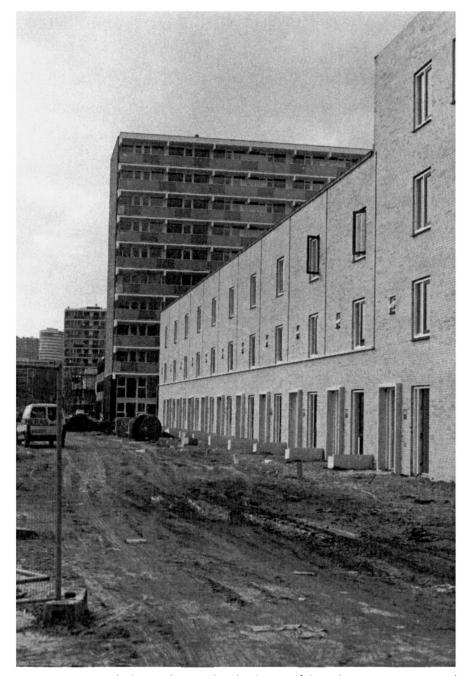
New terraces built over the arcadian landscape of the Bijlmermeer estate in south-east Amesterdam, to form a connective street fabric. *Source*: author's photograph
